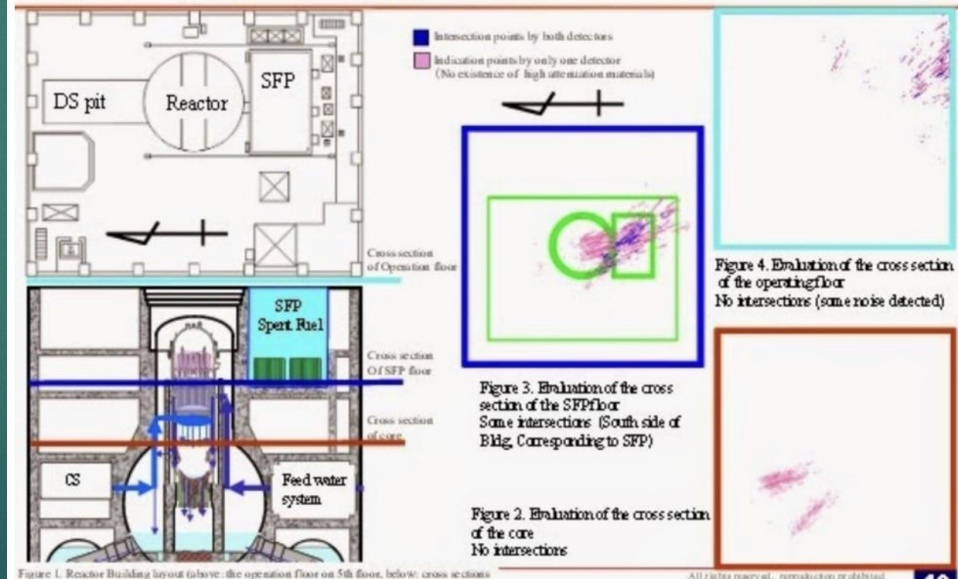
Reactor Building layout (above: the operation floor on 5th floor, below: cross sections)
